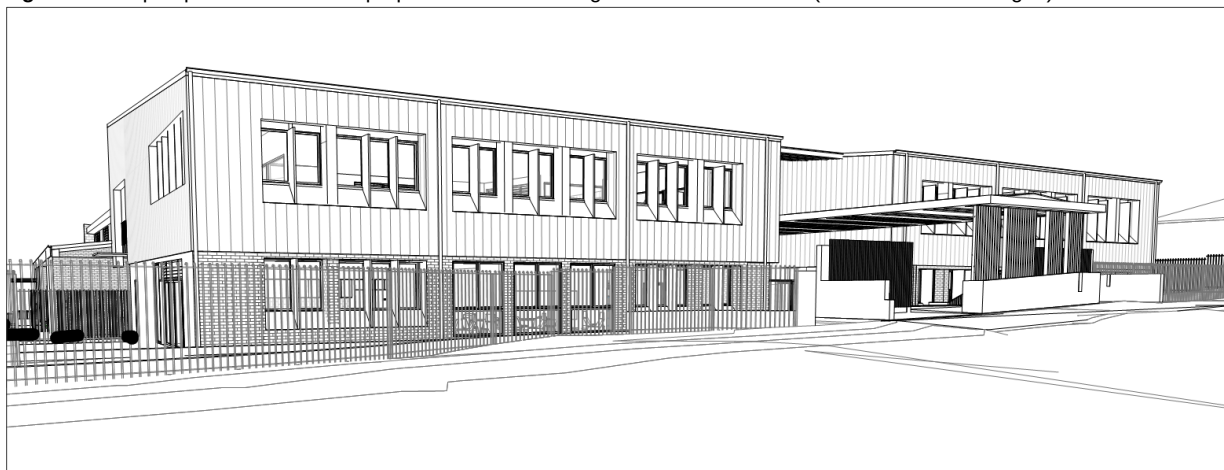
3D perspective of the proposed new building – view from Railway Street. (Source: Conrad Gargett)
